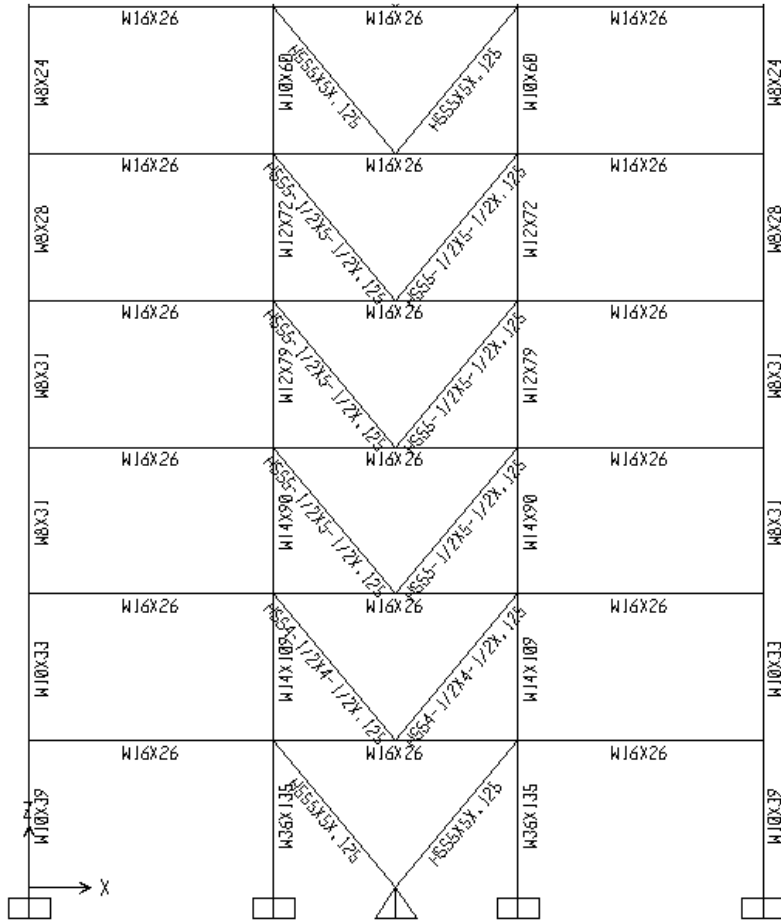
b: Design Sections of bottom 6 stories of 12-story V-braced frame.
